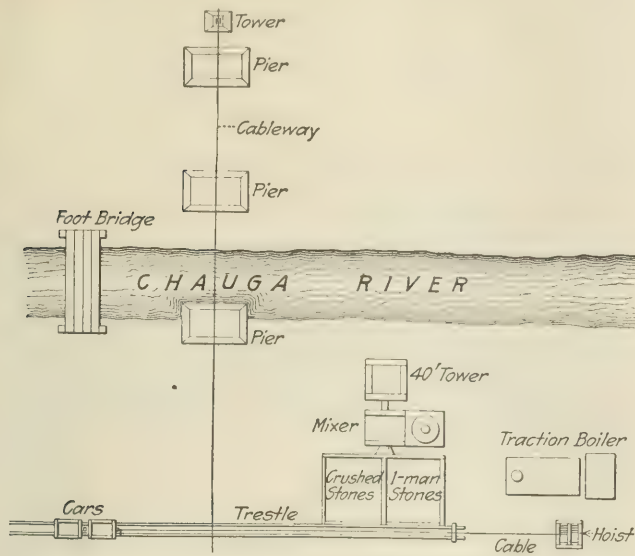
HOW FOUNDATIONS OF LITTLE CHAUGA BRIDGE ARE CONCRETED
